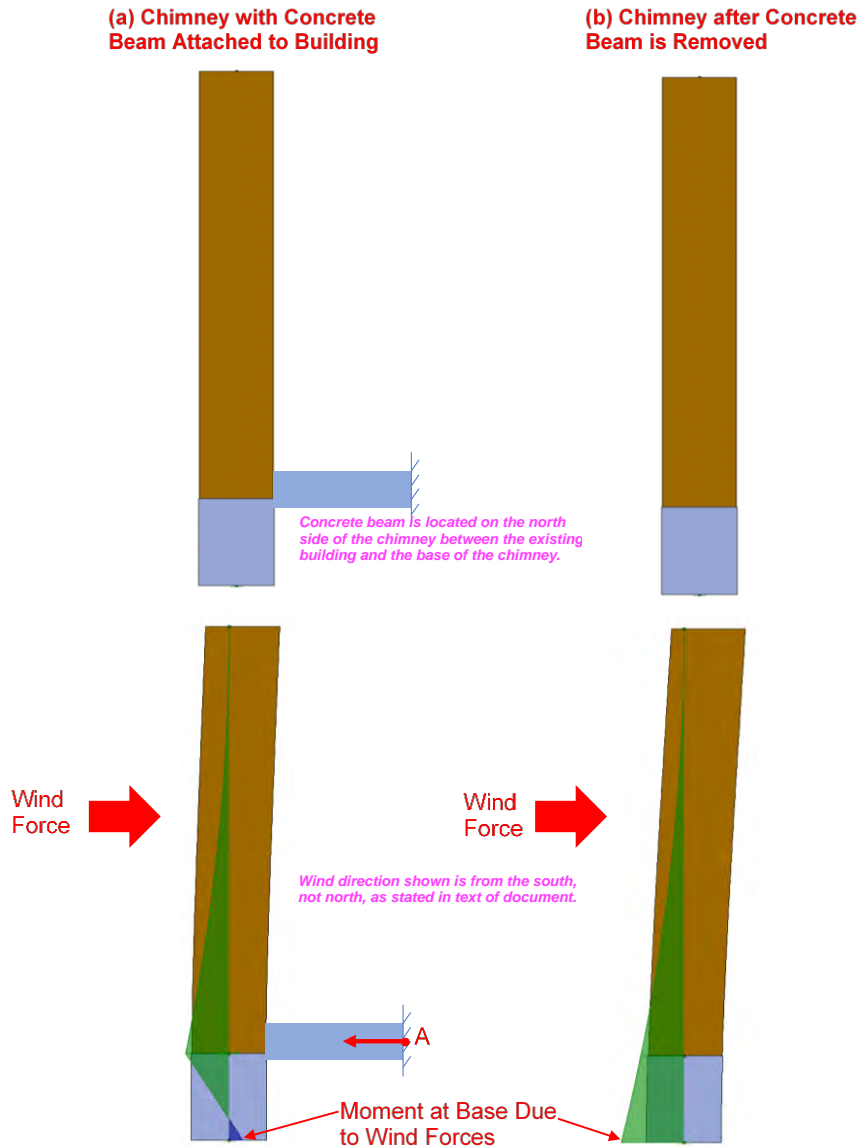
Concrete beam attachment to chimney and the adjacent building.
